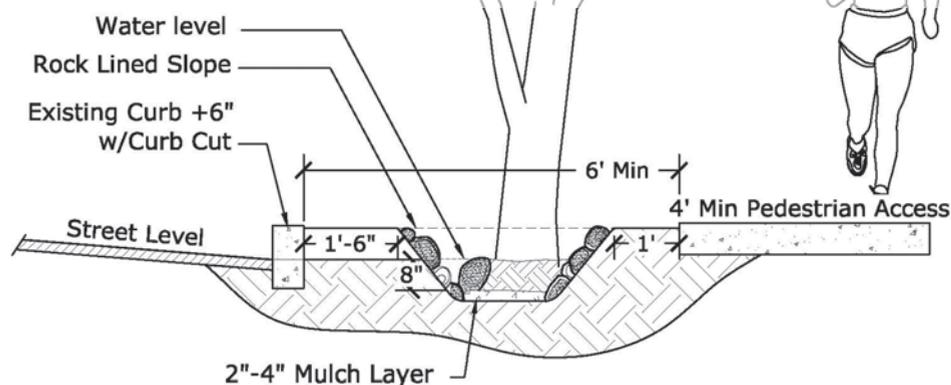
Typical cross-section of a basin with rock-lined edges, showing typical setbacks for a site on a residential street with on-street parking (for plan view see Appendix).
